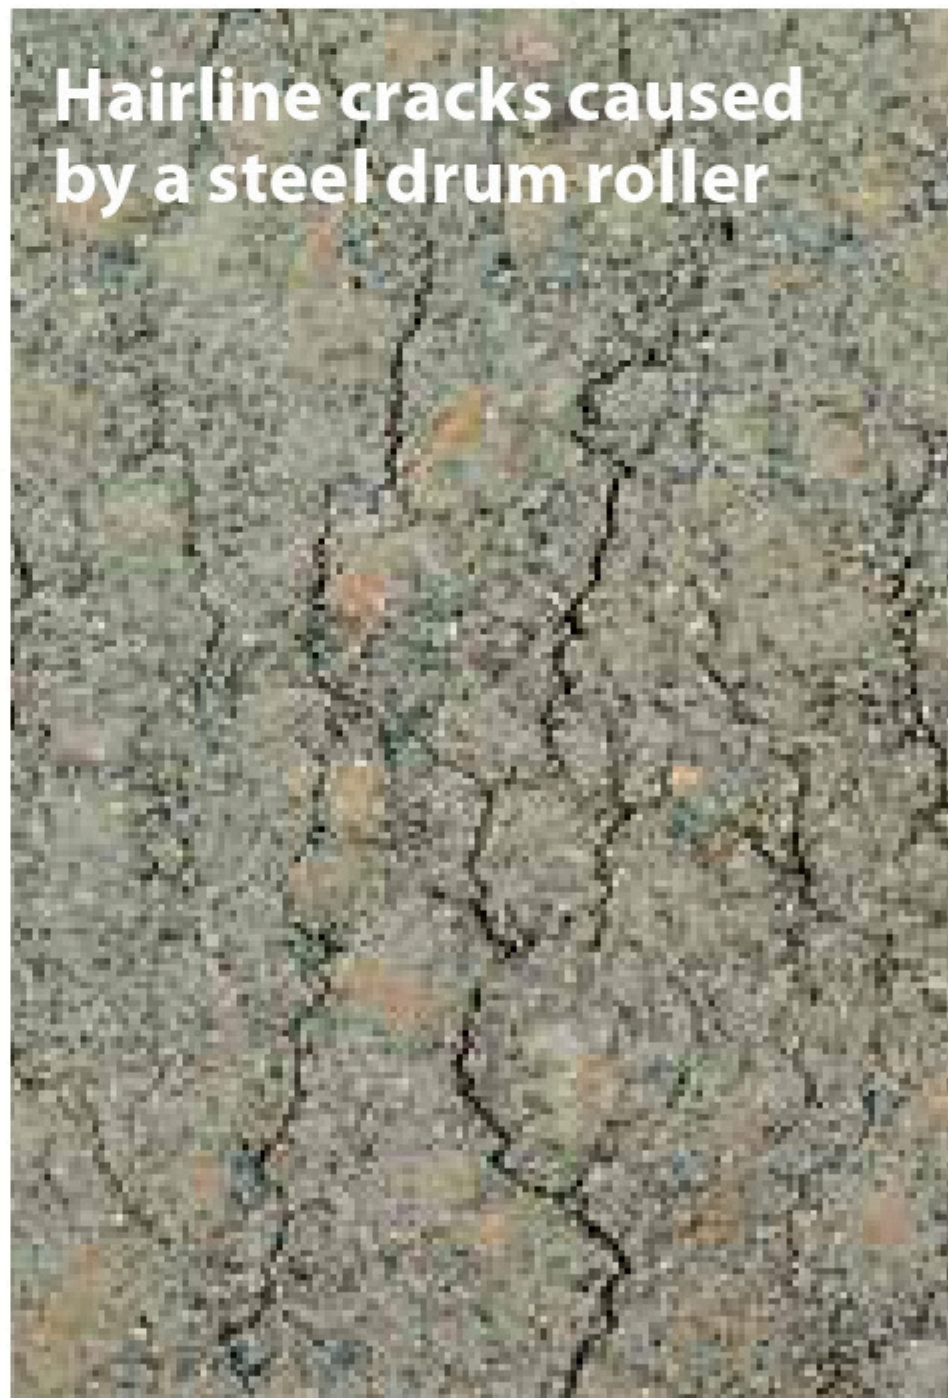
Sealing the surface of Roller Compacted Concrete Pavement (RCCP)
